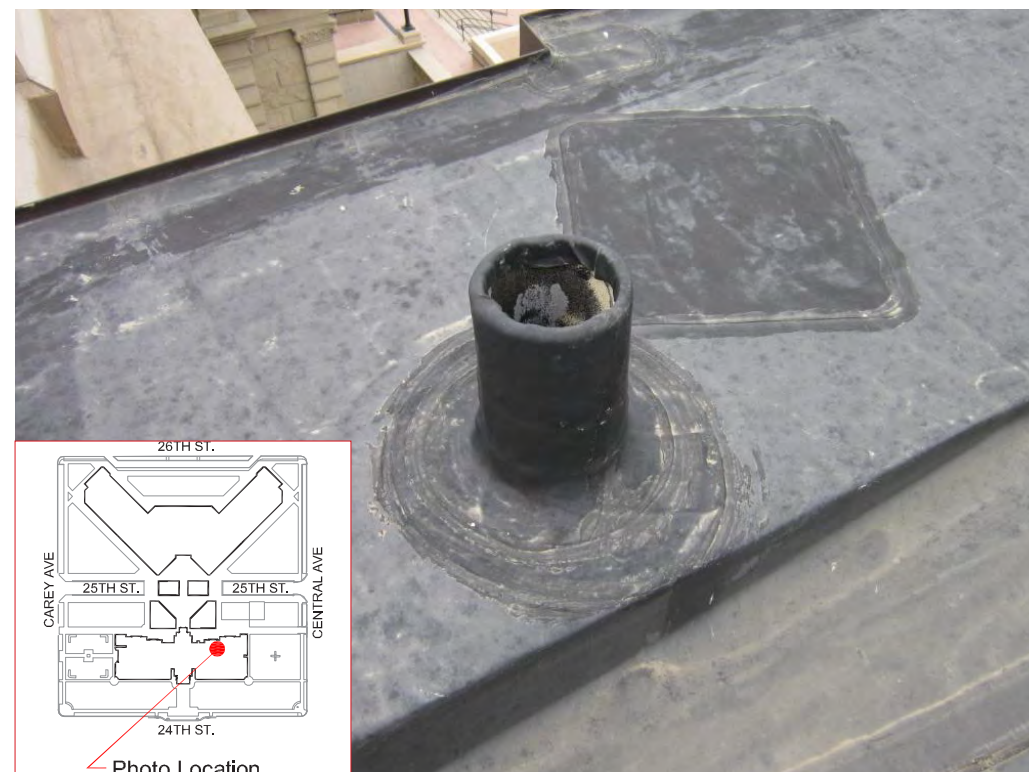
Existing Sanitary Vent Penetration at Roof Level. Building Codes states that all new vent stacks must extend minimum of twelve inches above the roof level.
